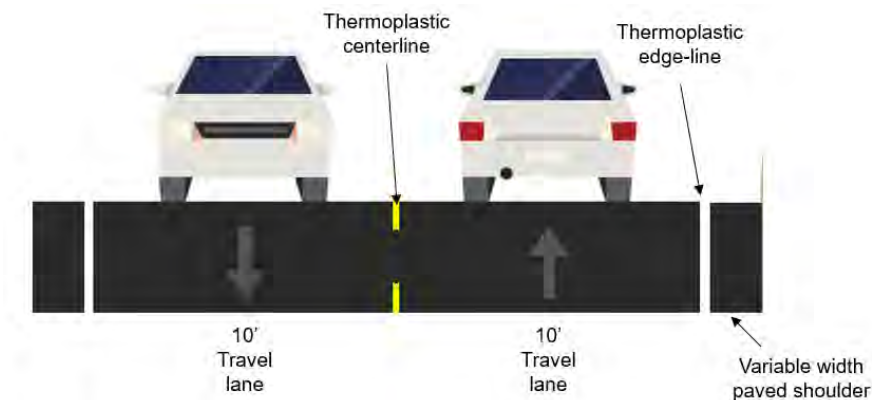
Proposed Cross Section at East Street, West Street, and Hector Street
